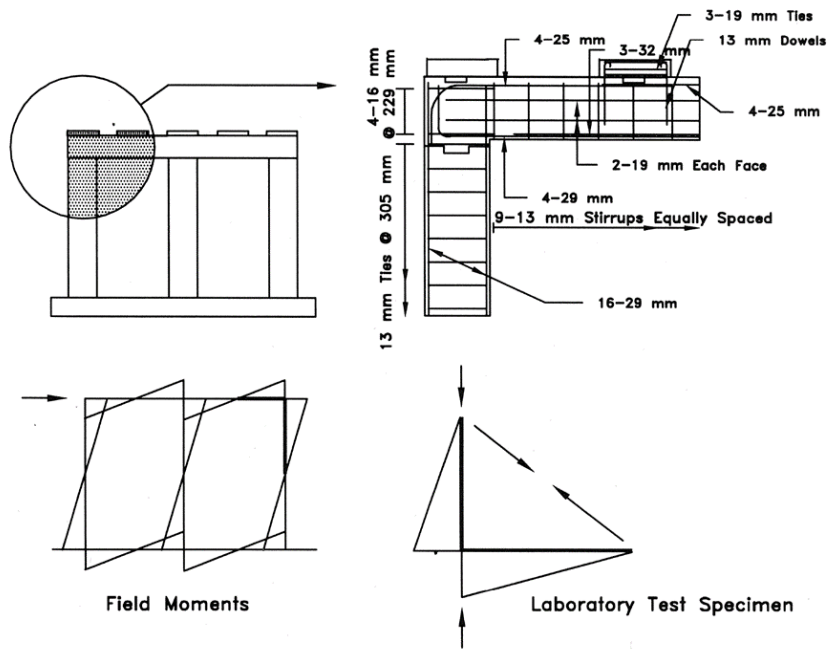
Retrieval Location of Specimens from Niagara Parkway Bridge.
